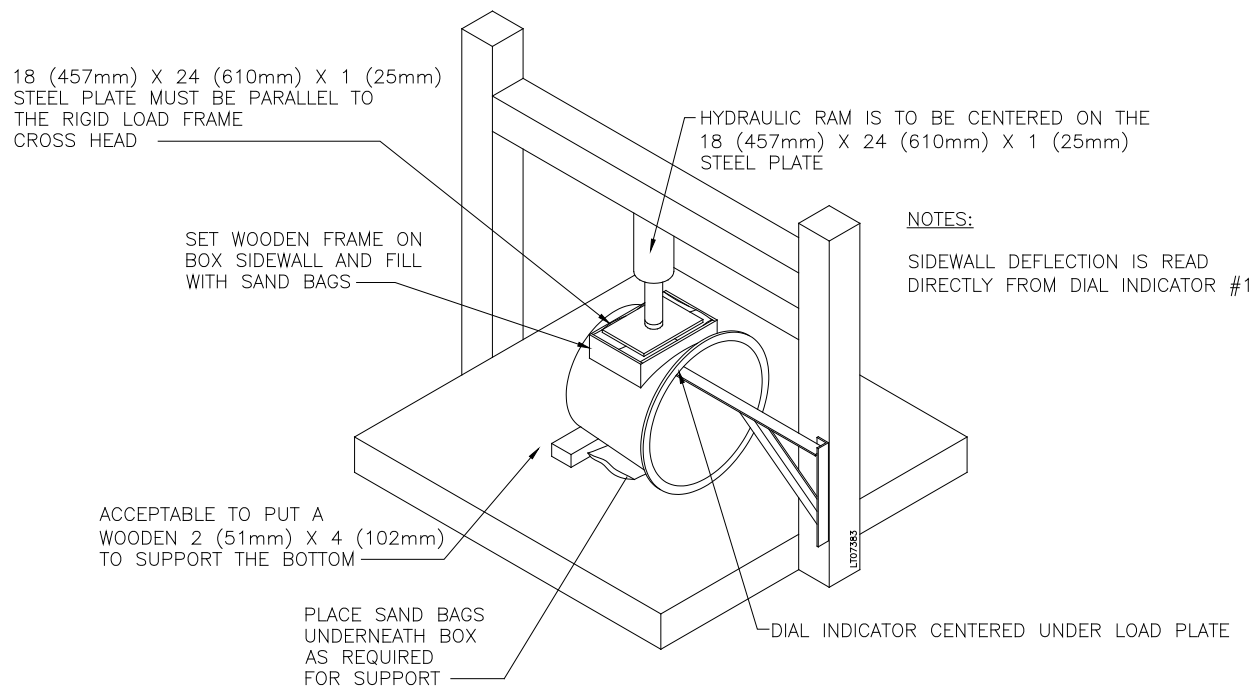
Box Lateral Sidewall Test for Boxes < 60" Long
